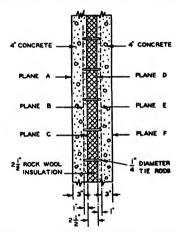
Section of Concrete Wall Having Steel Tie Rods and Insulation
